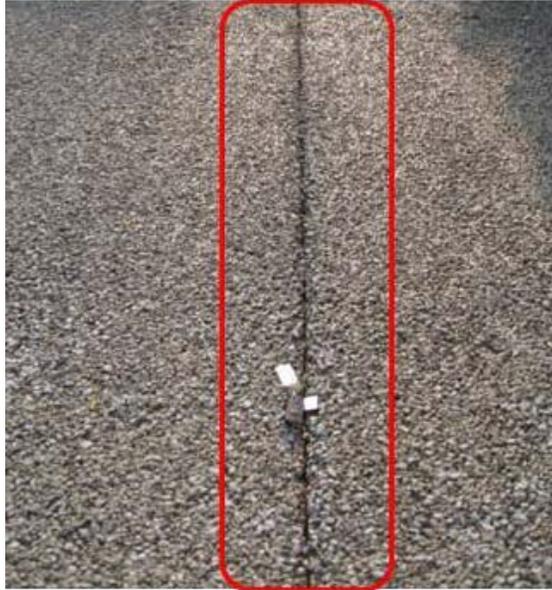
Formed Joint after Construction Site 1 October 2008 (16 Months)
